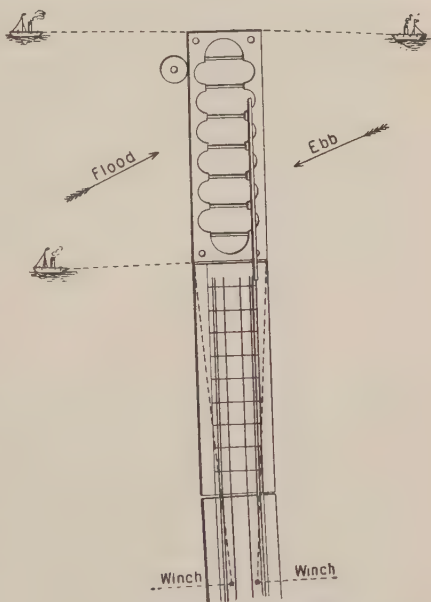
Aligning Caisson, Zeebrugge Harbour Works.
